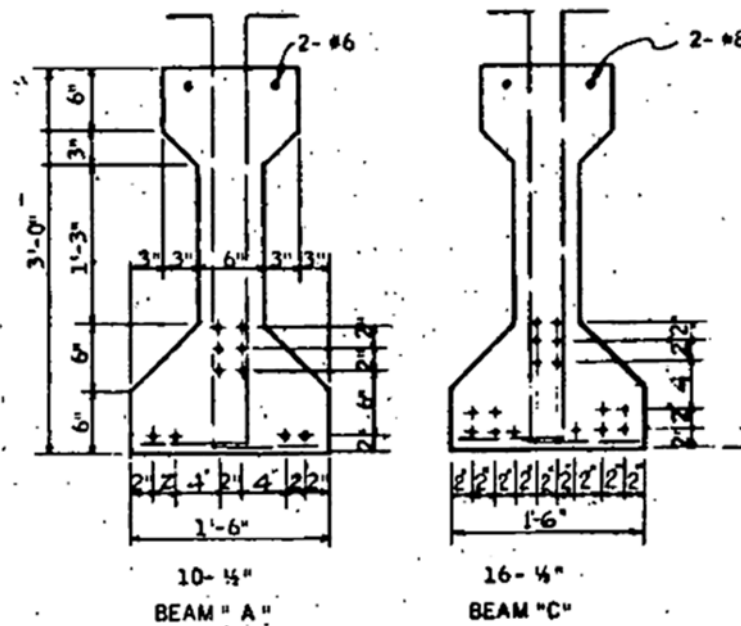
Midspan cross-section view of Beam "A" and Beam "C"
